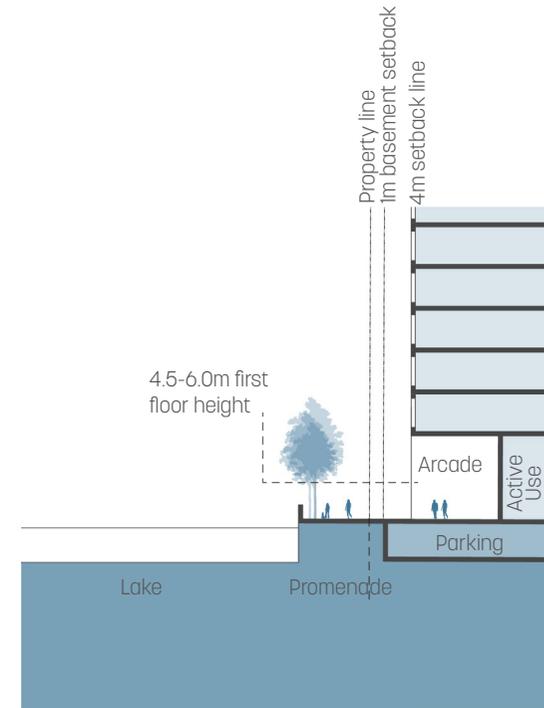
Section of Cultural Centre Building, located within Lakefront Park
